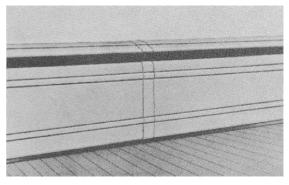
Installing joint pieces. (Courtesy Vulcan Radiator Co.)
